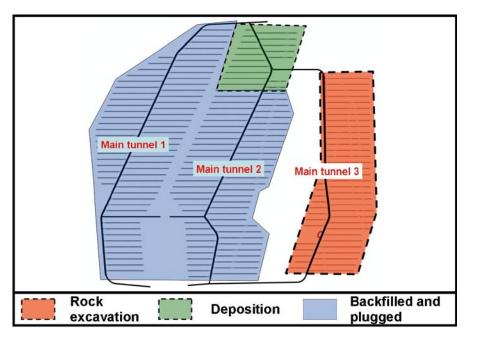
All of main tunnel 3 has to be excavated before deposition can start. The deposition tunnels have to be held open for a long time.
